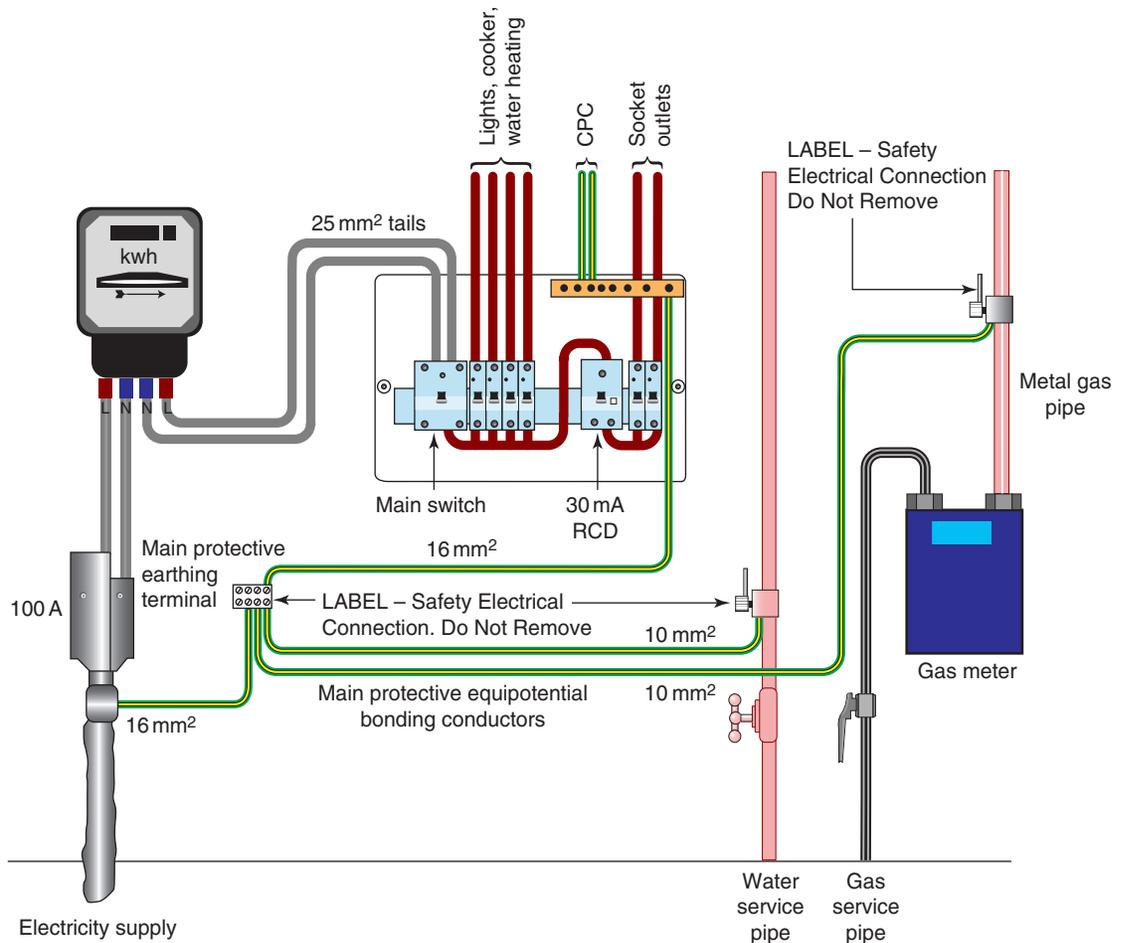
Cable sheath earth supply (TN-S system) showing earthing and main protective equipotential bonding arrangements.
